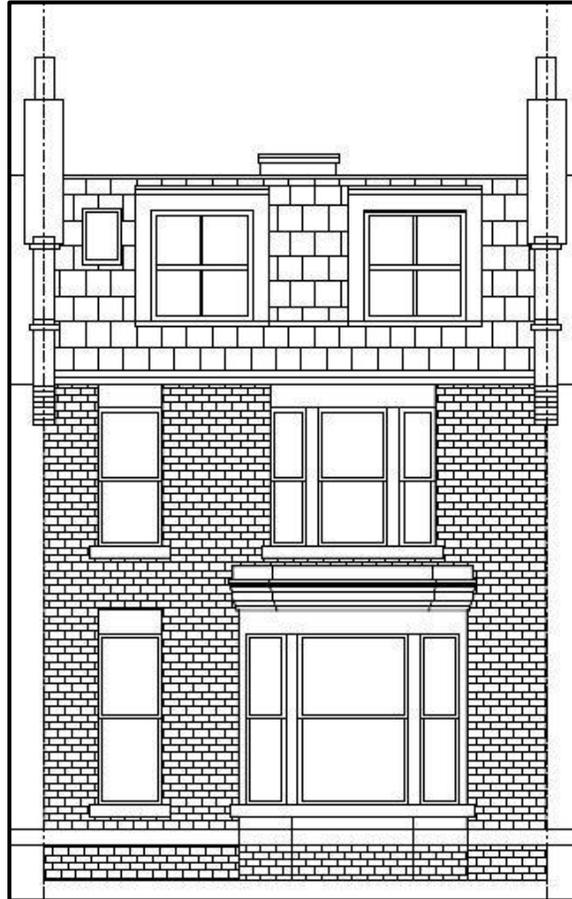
Existing View: Front elevation 15 Castellain Road
